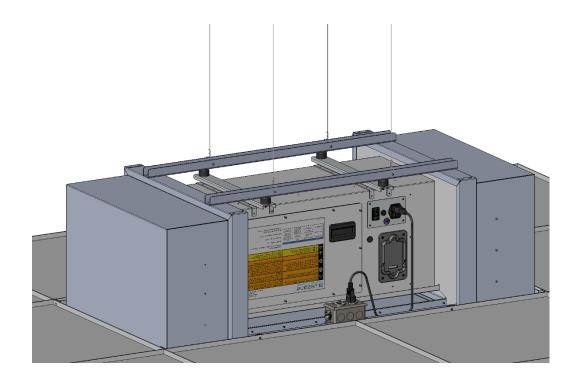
Bluezone Ceiling Mount Kit Dimensions (fits in a 2'x4' drop ceiling tile or two 2'x2' ceiling tiles)
